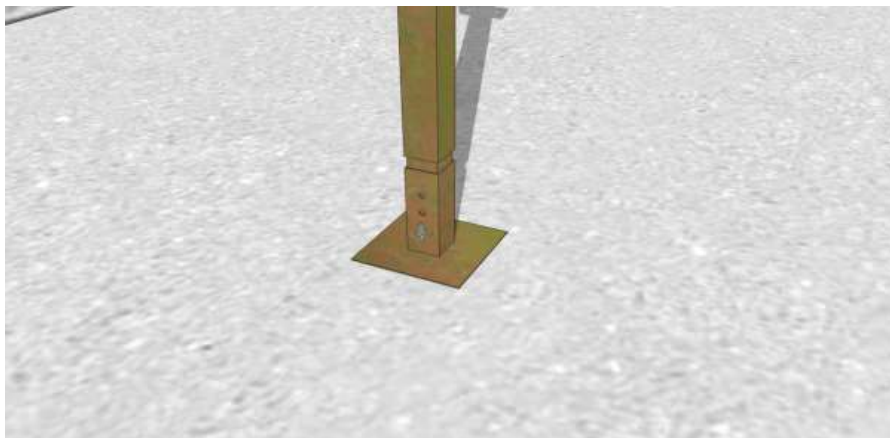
Example of compromised access due to 1st lift scaffold being erected prior to Access Platform Decking system installation
